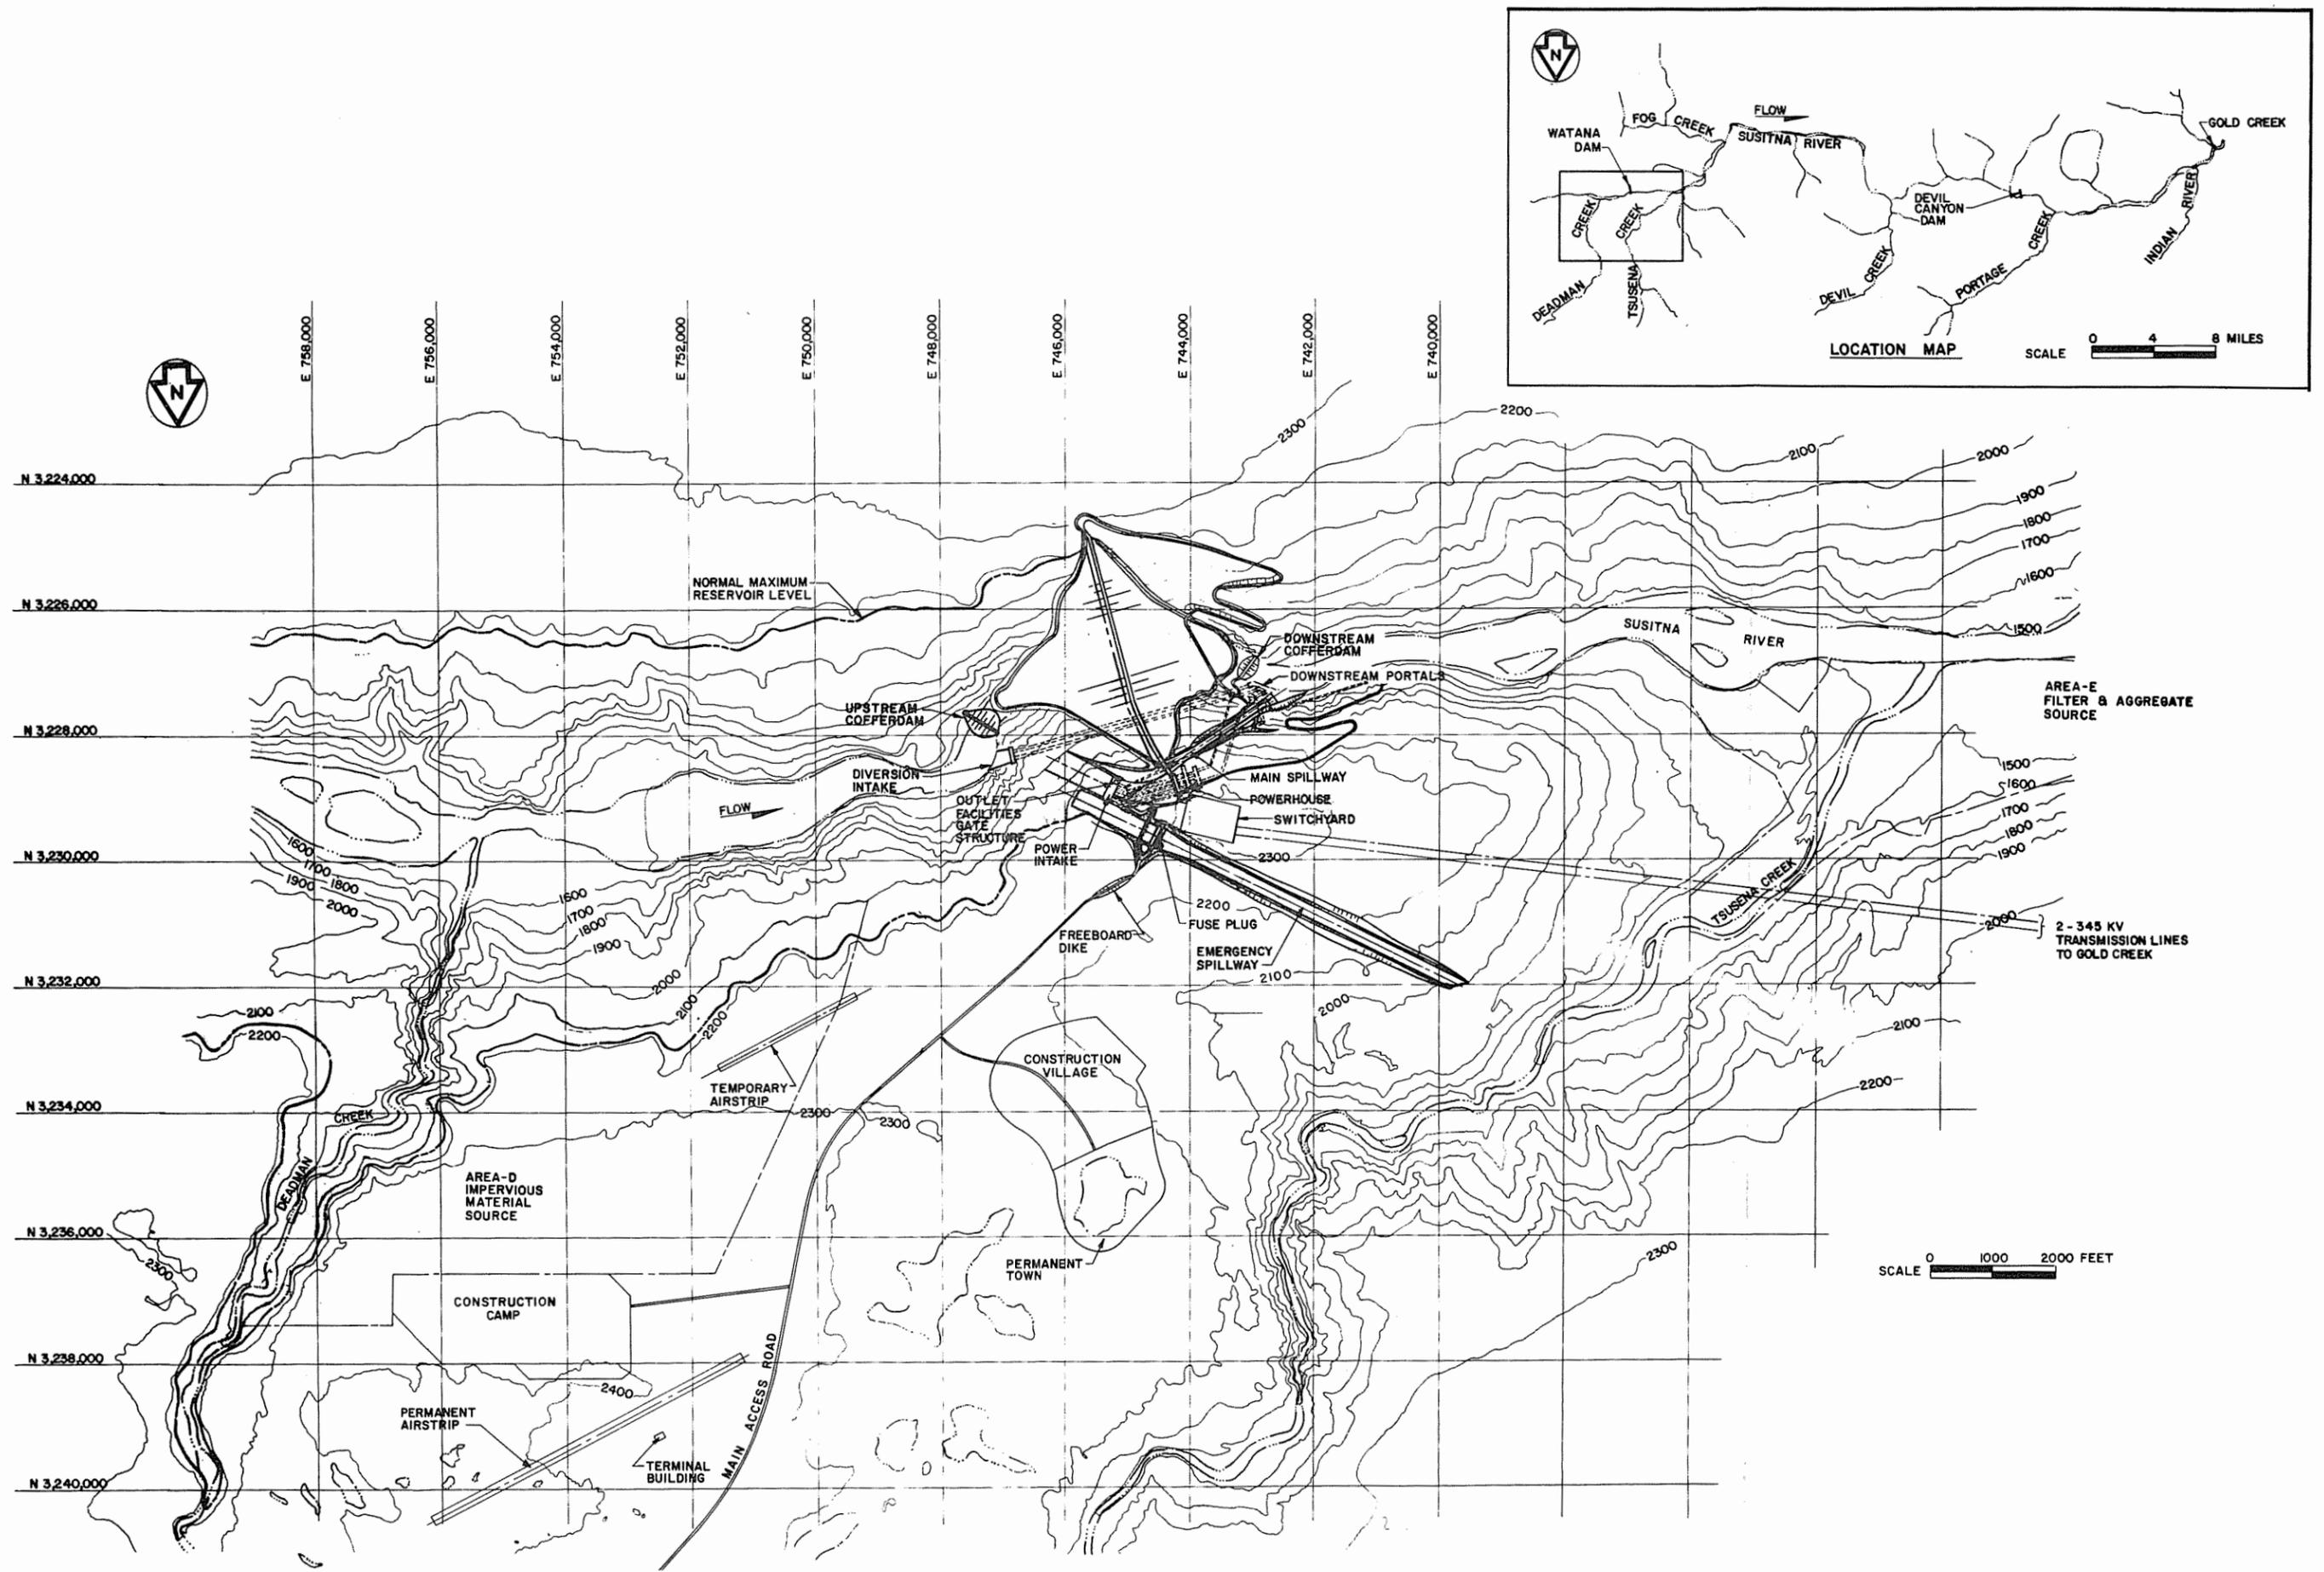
Watana Facilities--Plan. [Source: Application Exhibit F, Plate F3]
